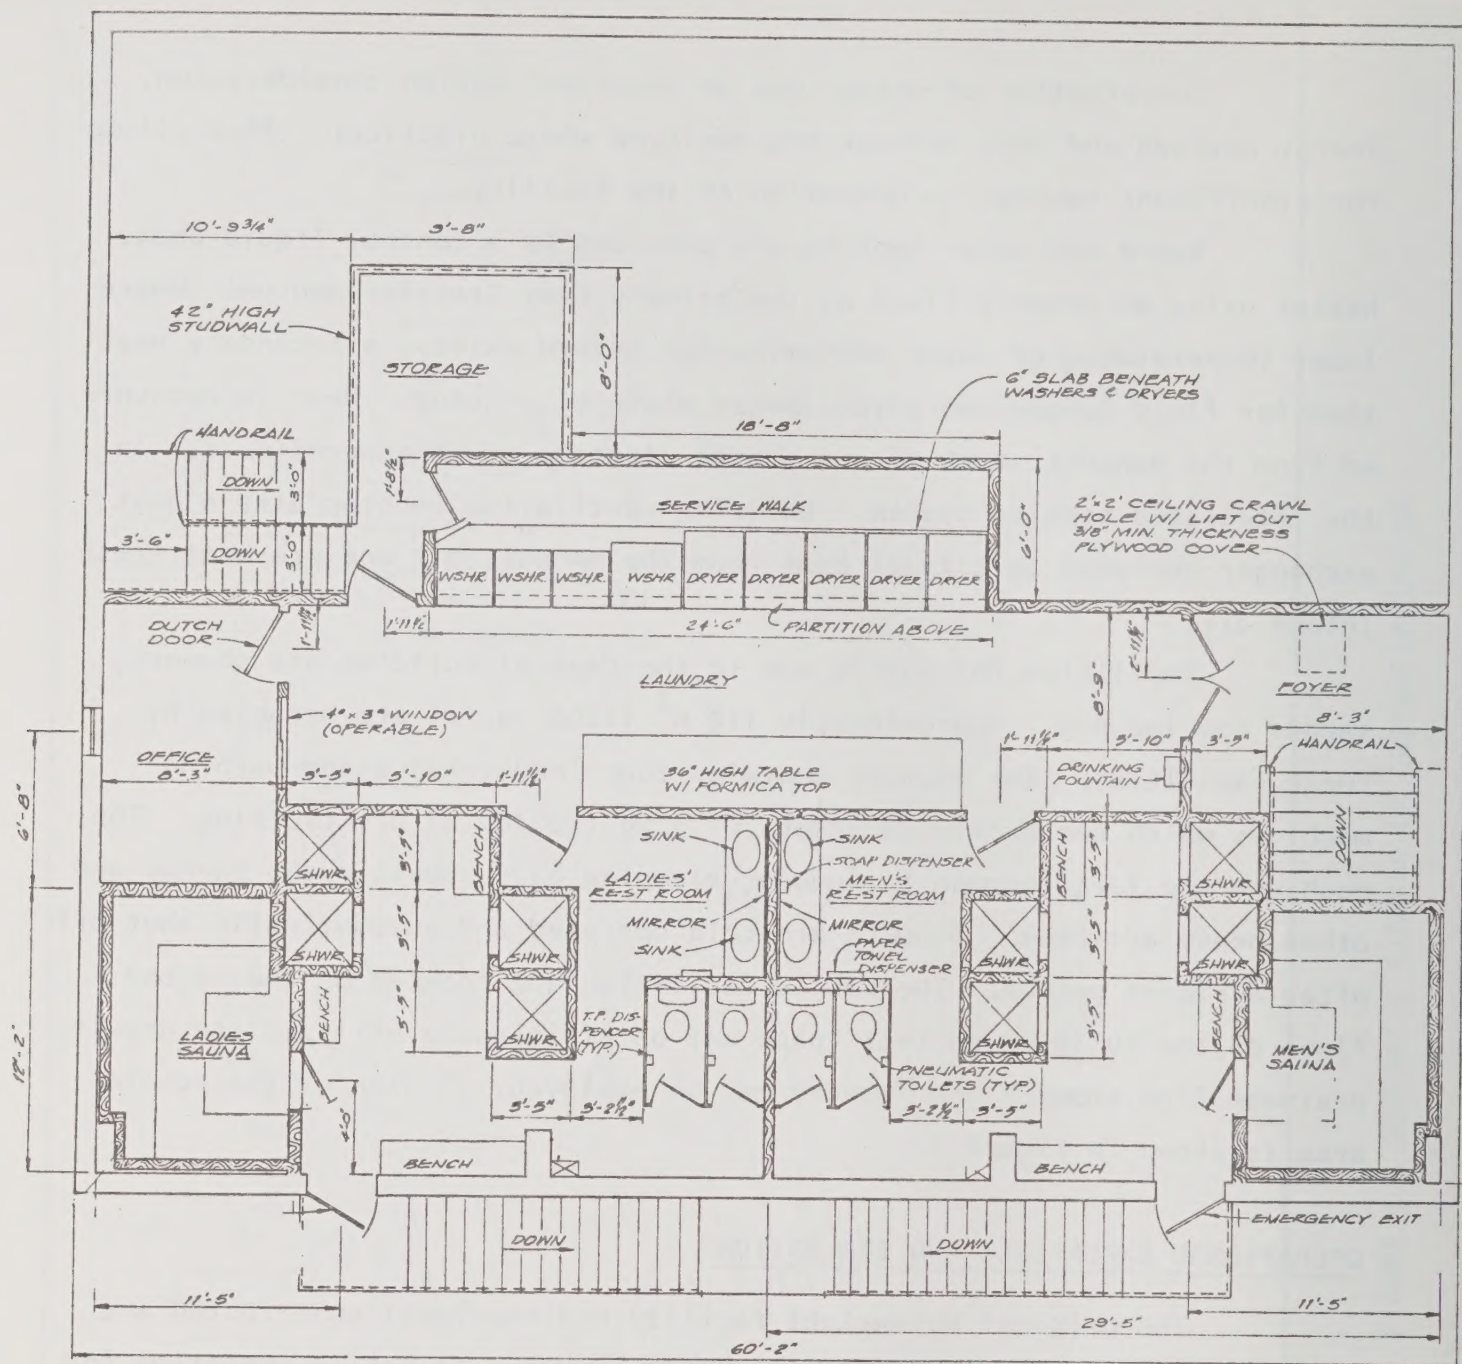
PLAN OF PUBLIC AREA IN WAINWRIGHT FACILITY
